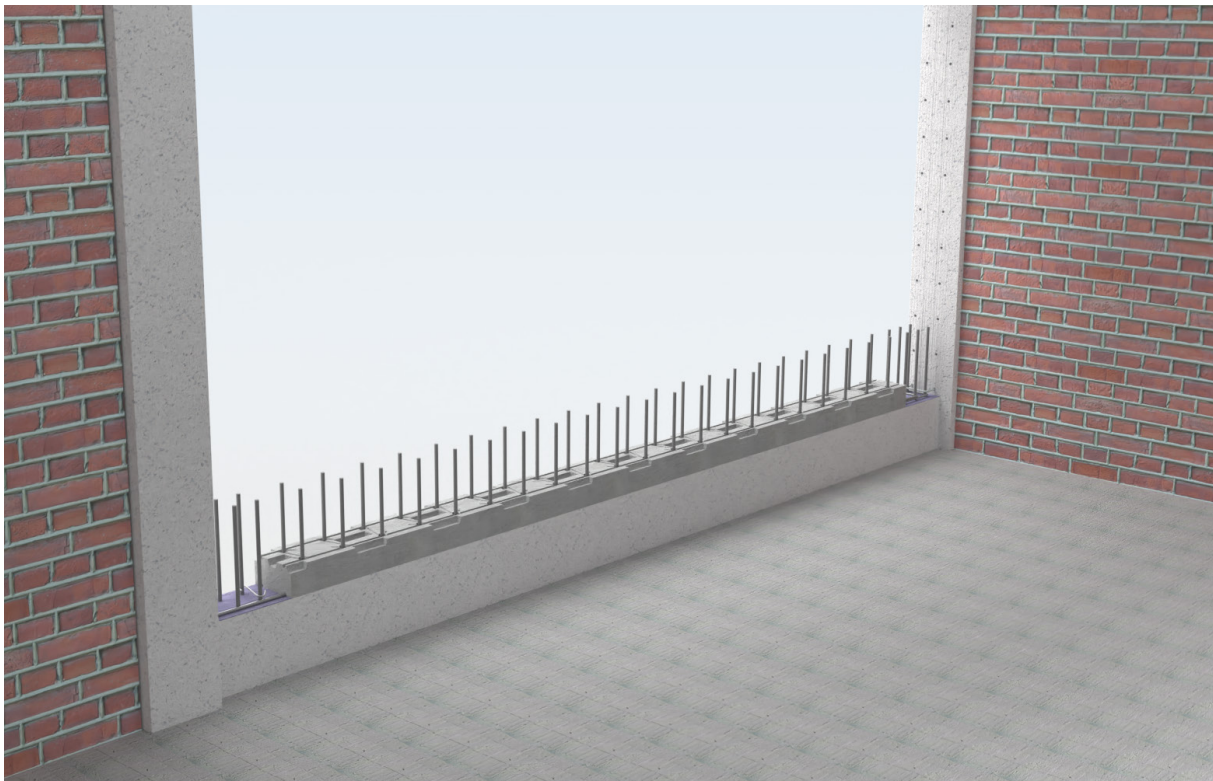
Step 7: Consequently, the first stirrup can be placed inside the adhesive. This stirrup element provides confinement around the longitudinal rebar and is looped around the edge vertical rebar multiple times finishing of with a 135° hook. This strong confinement should prevent the stirrup from getting loose during the cyclic seismic loading of an earthquake.
